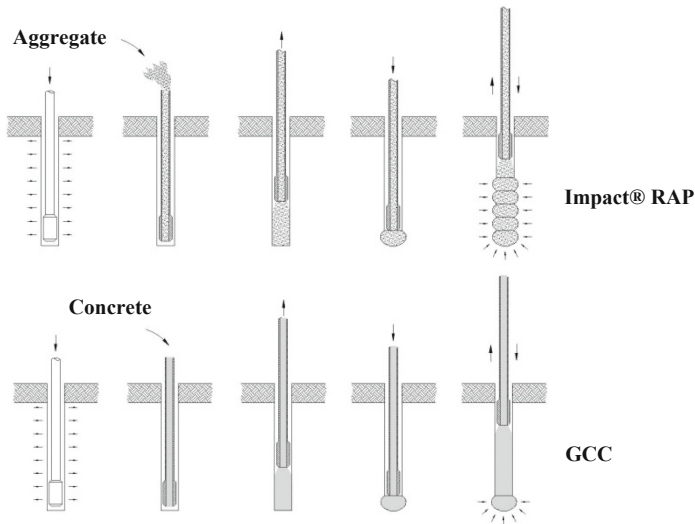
Construction methodology of Impact[®] RAP and GeoConcrete[®] Column elements.
